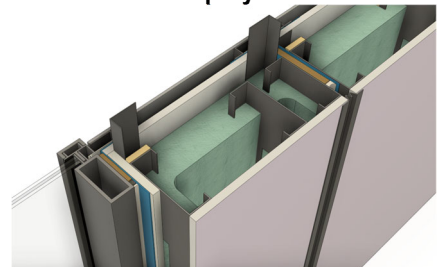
BKL with NFPA 285 approved wall opening with 5/8" gypsum sheathing, or 3/4" PT Plywood, or 1 1/2" PT wood at jamb and head returns. Panel joint closed with 4# mineral wool, compressed 50%.
